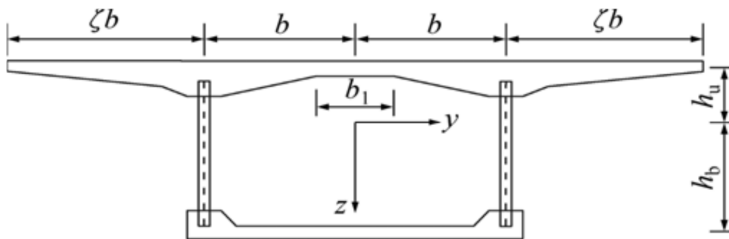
Sectional view of the PC box girder with corrugated steel webs
